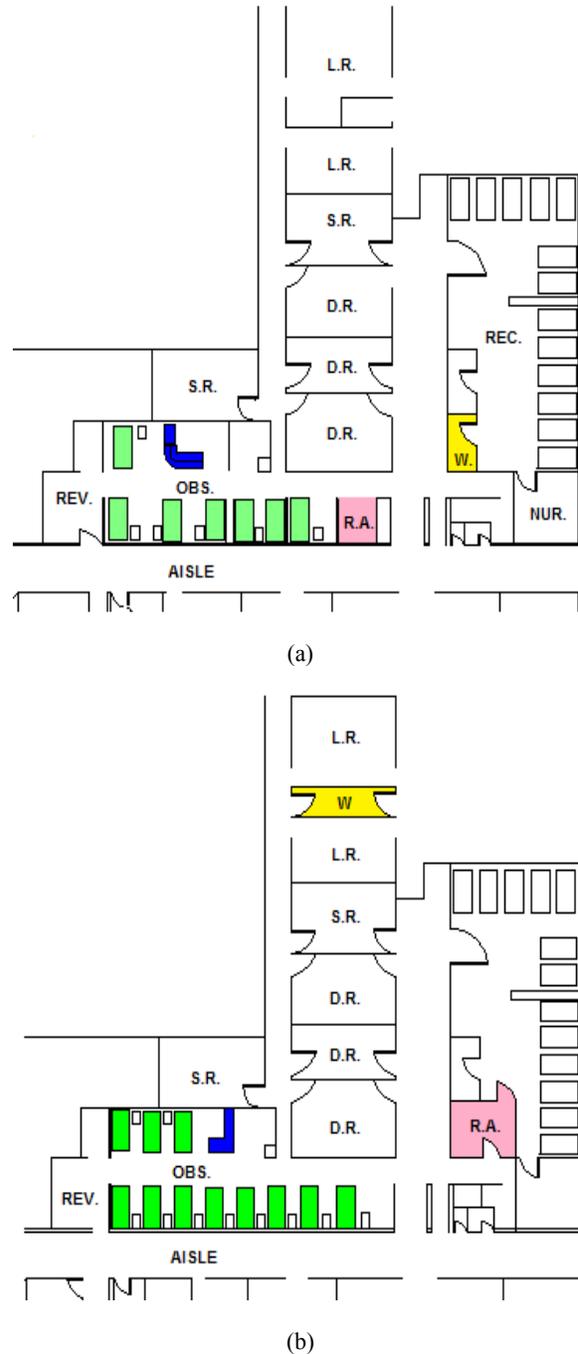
Layout of the obstetric/gynecology emergency department, (a) actual layout, (b) proposed layout
